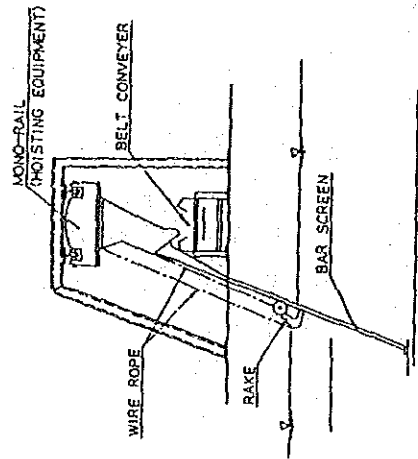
Proposed Plan of Appurtenant Structures for Pump Station
